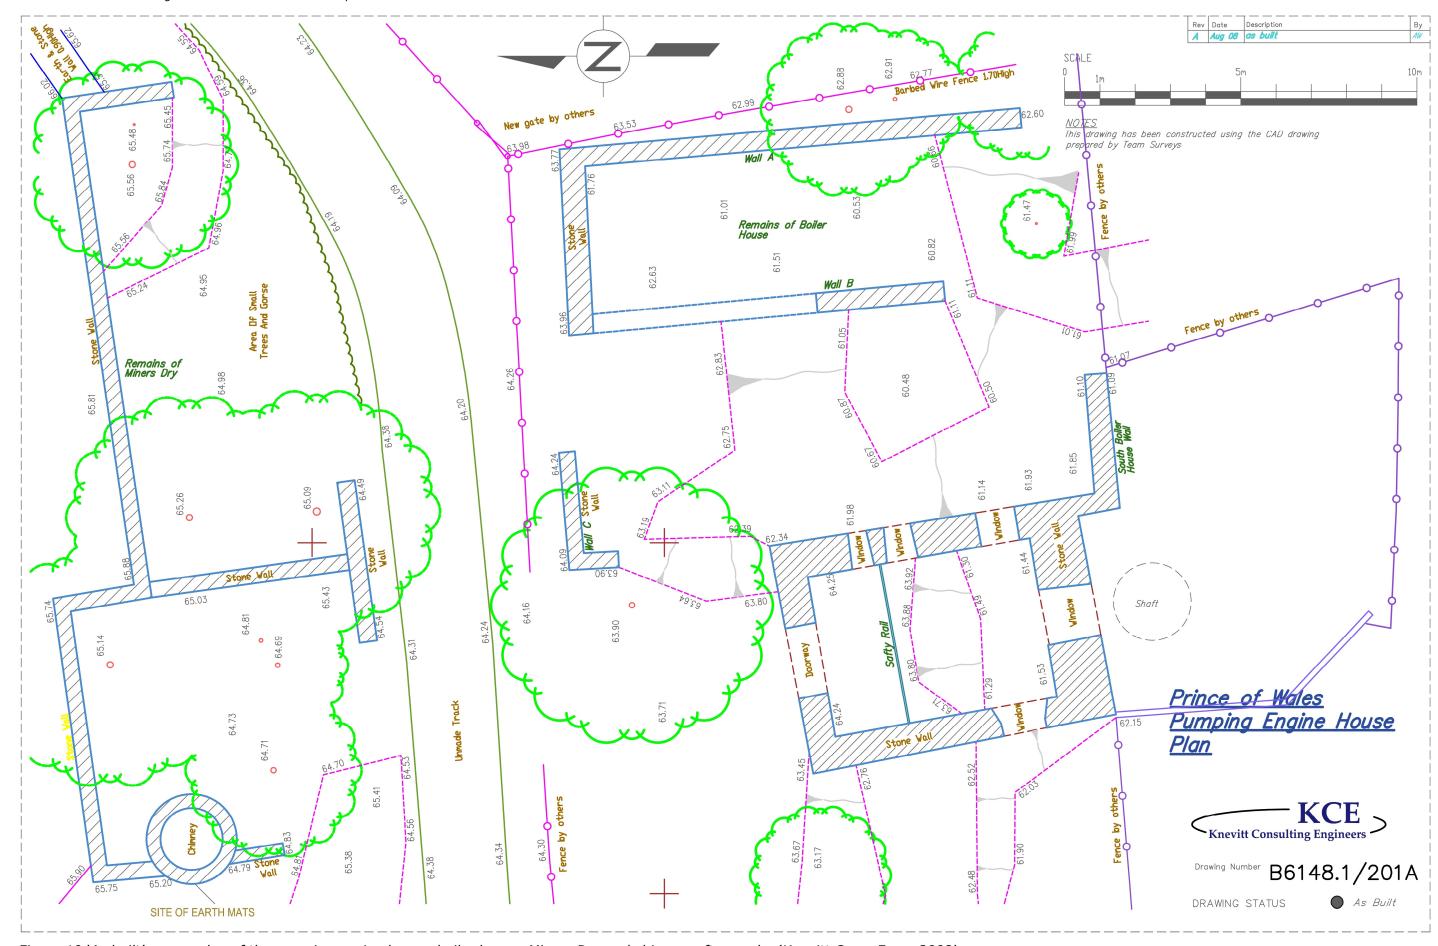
'As built' survey plan of the pumping engine house, boiler house, Miners Dry and chimney after works (Knevitt Cons. Engs. 2008)
